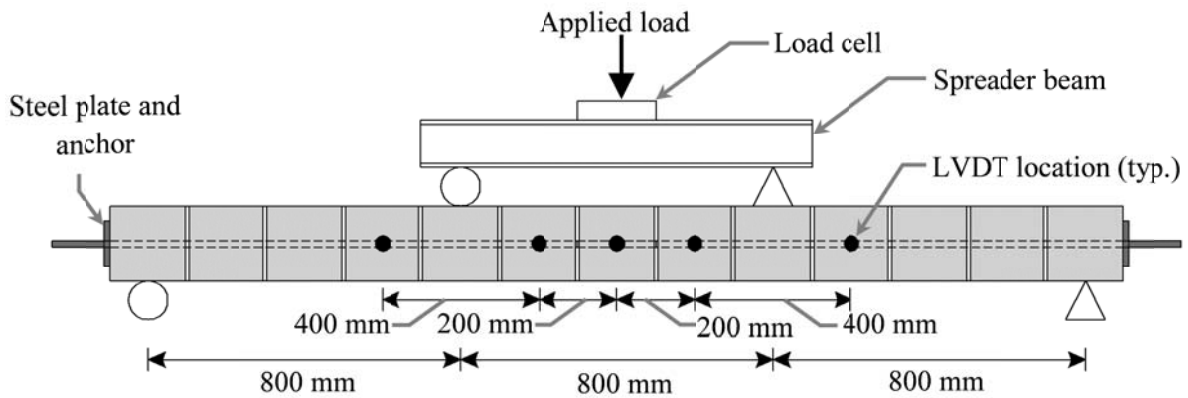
Loading Geometry and Instrumentation of Wall Splice Specimen.
